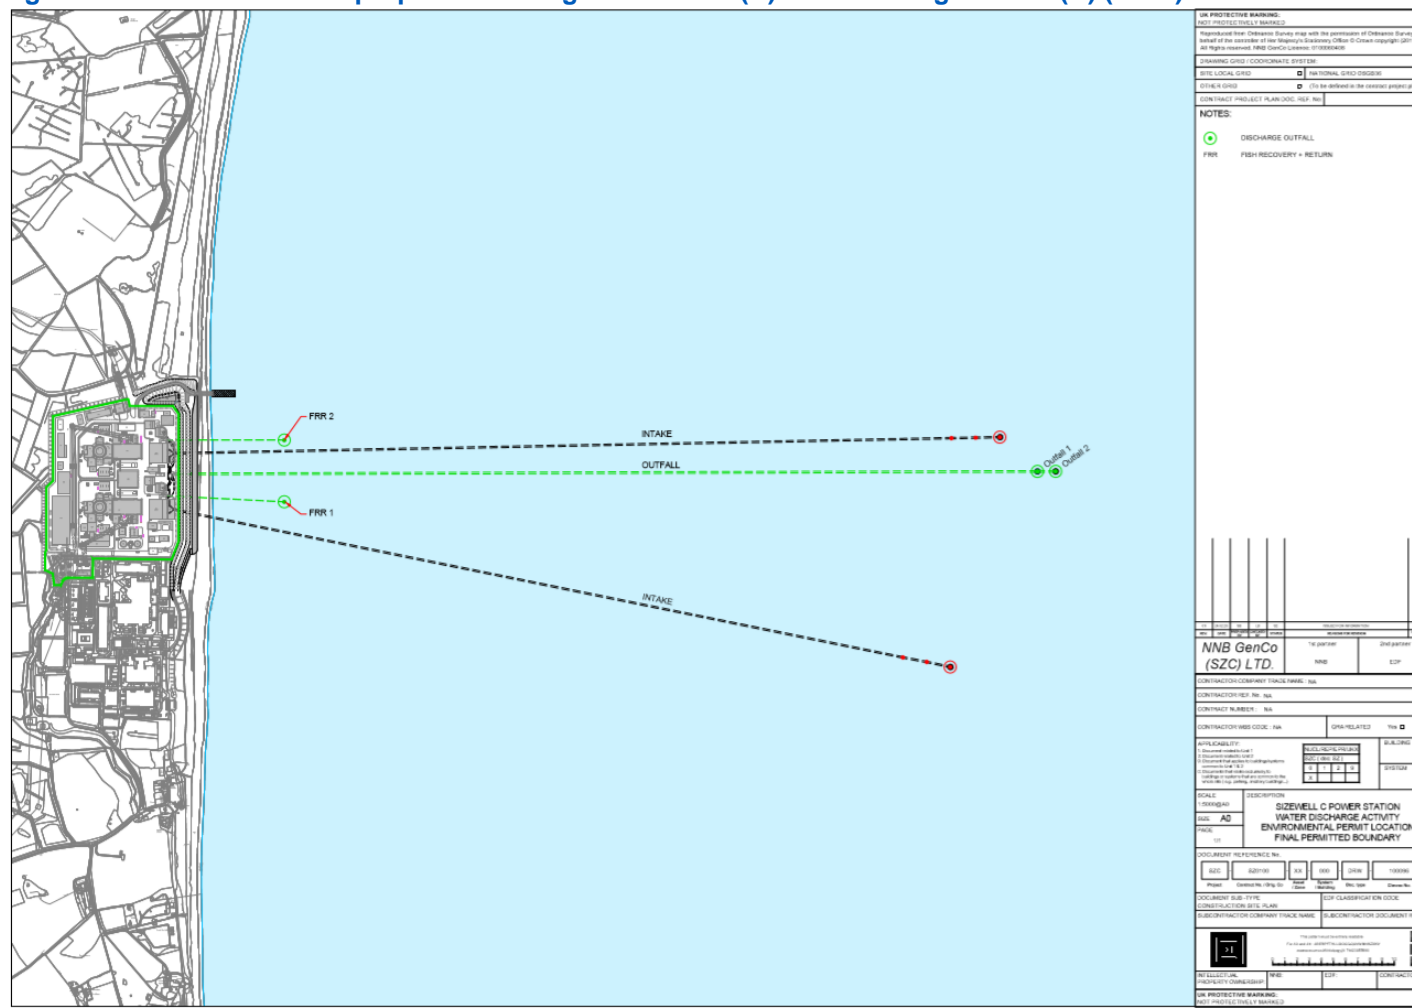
Conceptual diagram of the proposed Sizewell C power station
